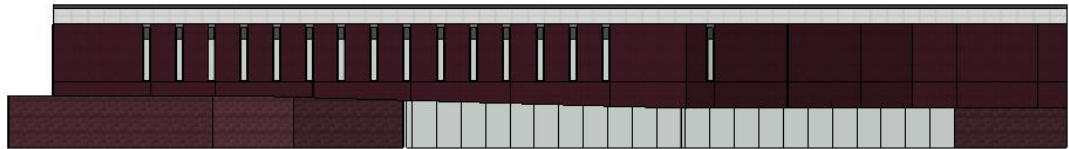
Original North Facade with Expansion Joints and Brick Angles (2)
